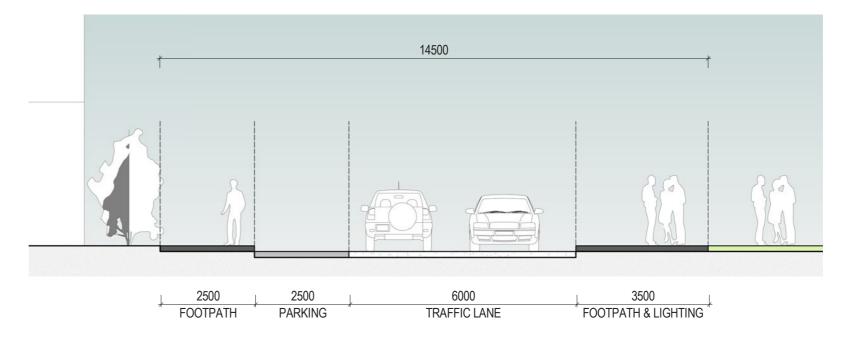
14.5m Wide Streets - Typical Section (Source: Ryde DCP 2014)
